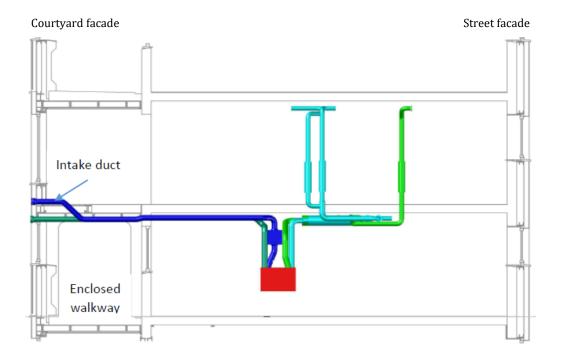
Section drawing of MVHR system in a typical maisonette (Green Building Store, 2013).
